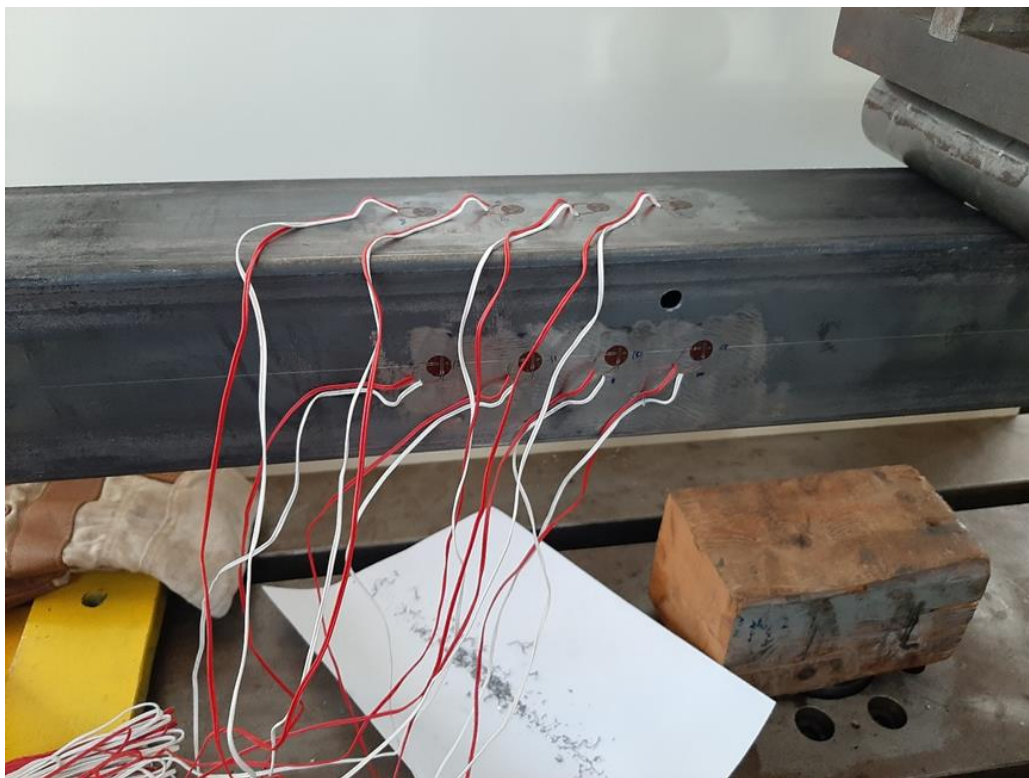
Test Specimen 1 / Case 1 in Actual Test Setting
